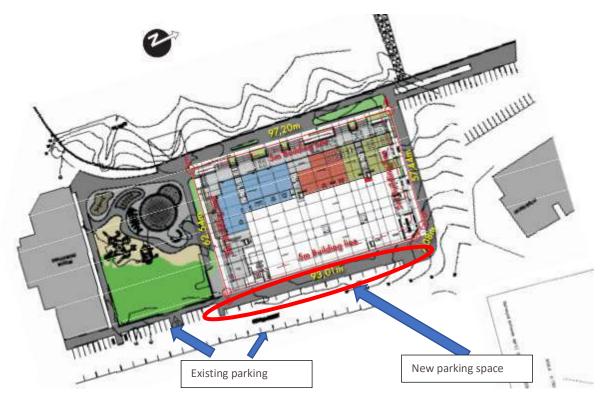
DIAGRAM INDICATING ON-STREET PARKING SPACES OUTSIDE THE BUILDING
